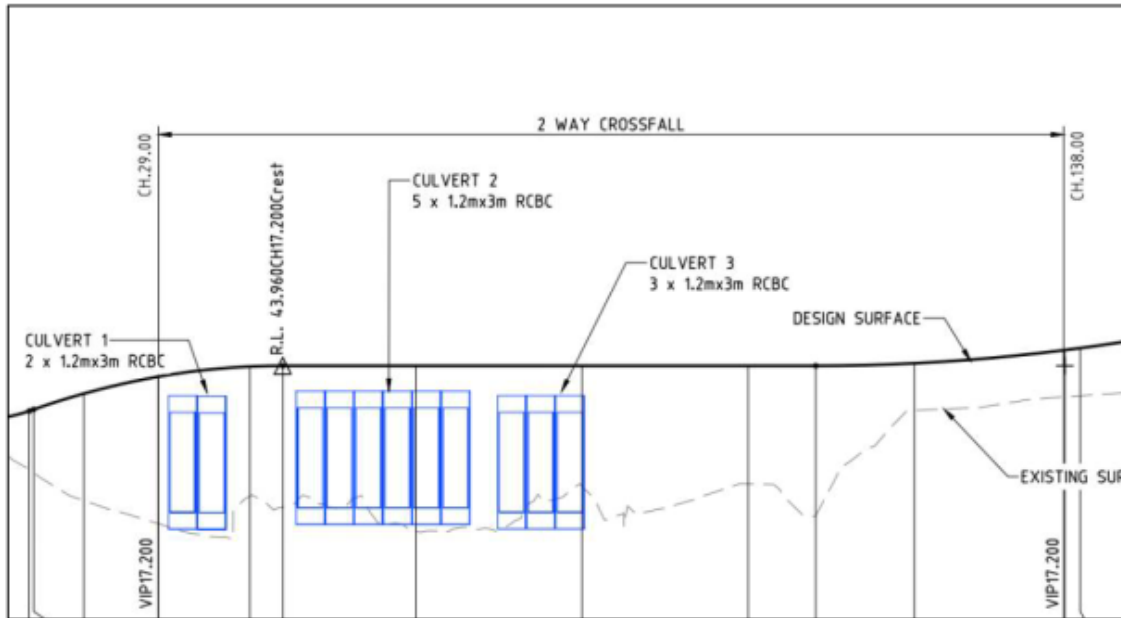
Proposed Cross Drainage Culverts Cross Section
